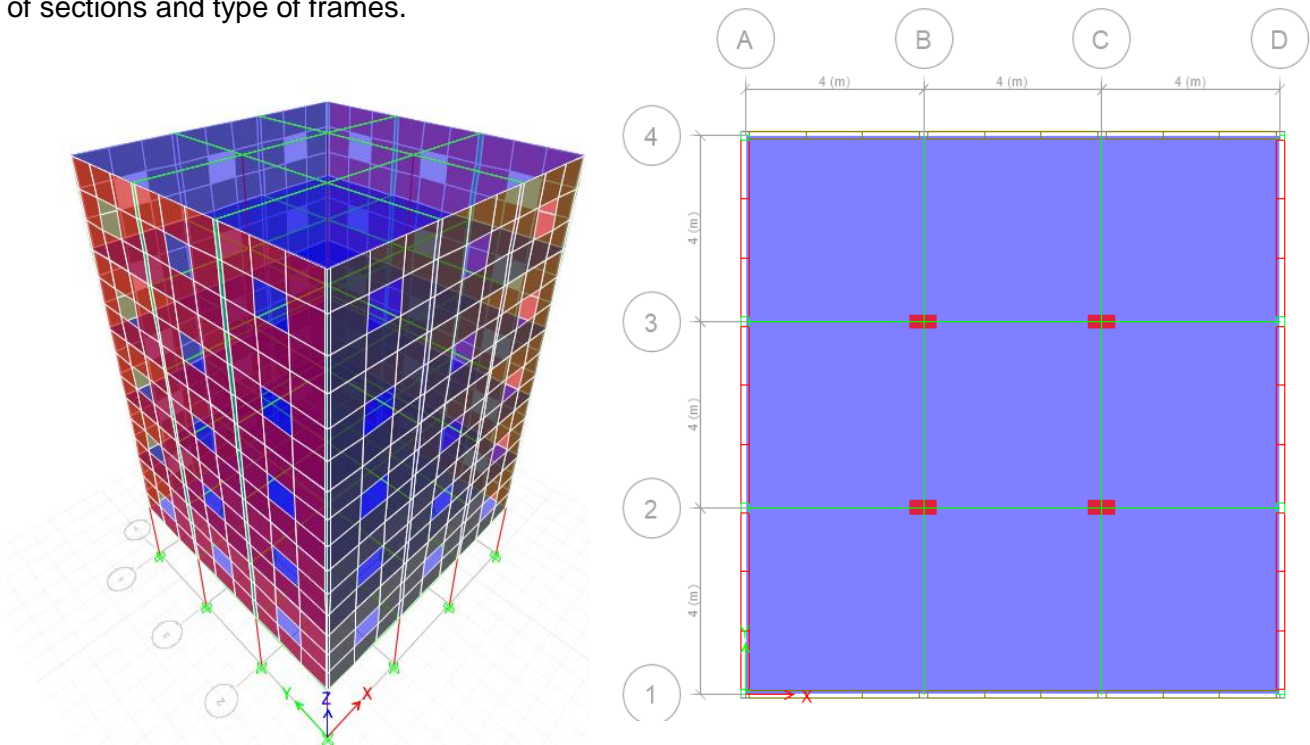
Typical Plan & 3D view of a computer model of 6 storey building
